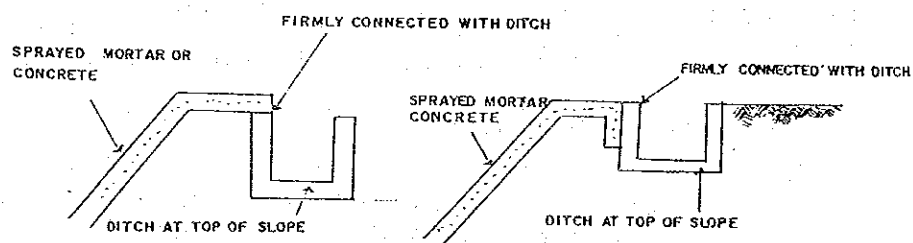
CONNECTION OF SPRAYED CONCRETE WITH DITCH
